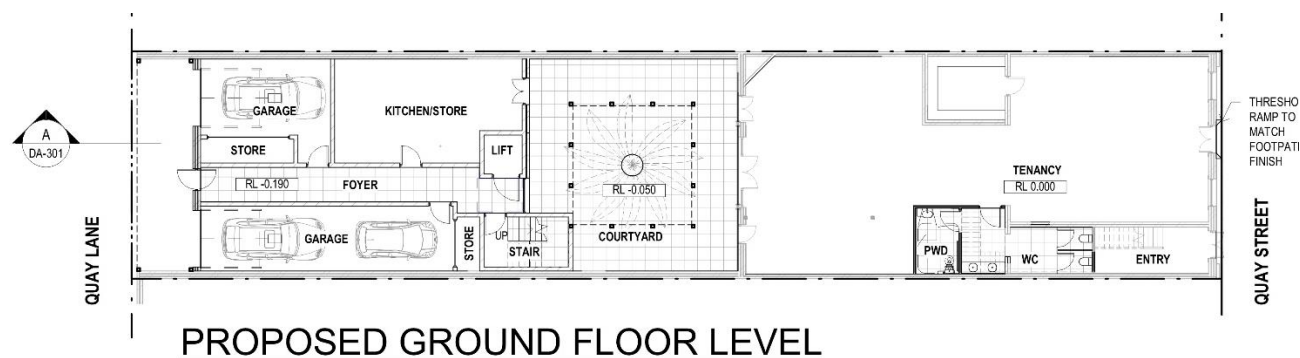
Proposed Ground Level Floor Plan showing the retention of the former banking chamber – with strongroom enclosure intact – and the installation of new bathroom facilities beneath the entrance staircase in order to service this tenancy space. The rear wall of the (former) Bank building is retained and an open courtyard space is established immediately behind same. The rear portion of the subject site will accommodate a new structure comprising residential parking for the dwelling units above and a Kitchen / Store area and associated servicing bay related to the ground level commercial tenancy at the front of the building. (Source: Feather & Lawry Design)
